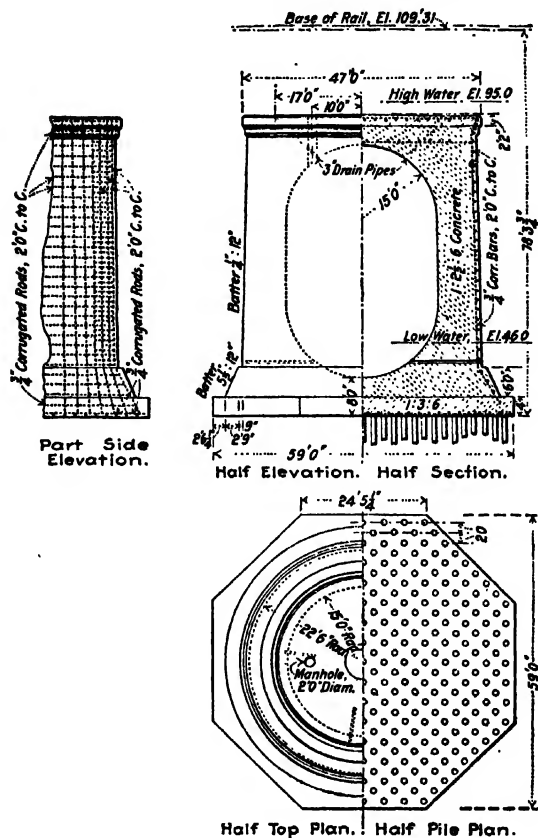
Reinforced-Concrete Pivot Pier, Illinois Central Railroad Bridge, Gilbertsville, Ky.
